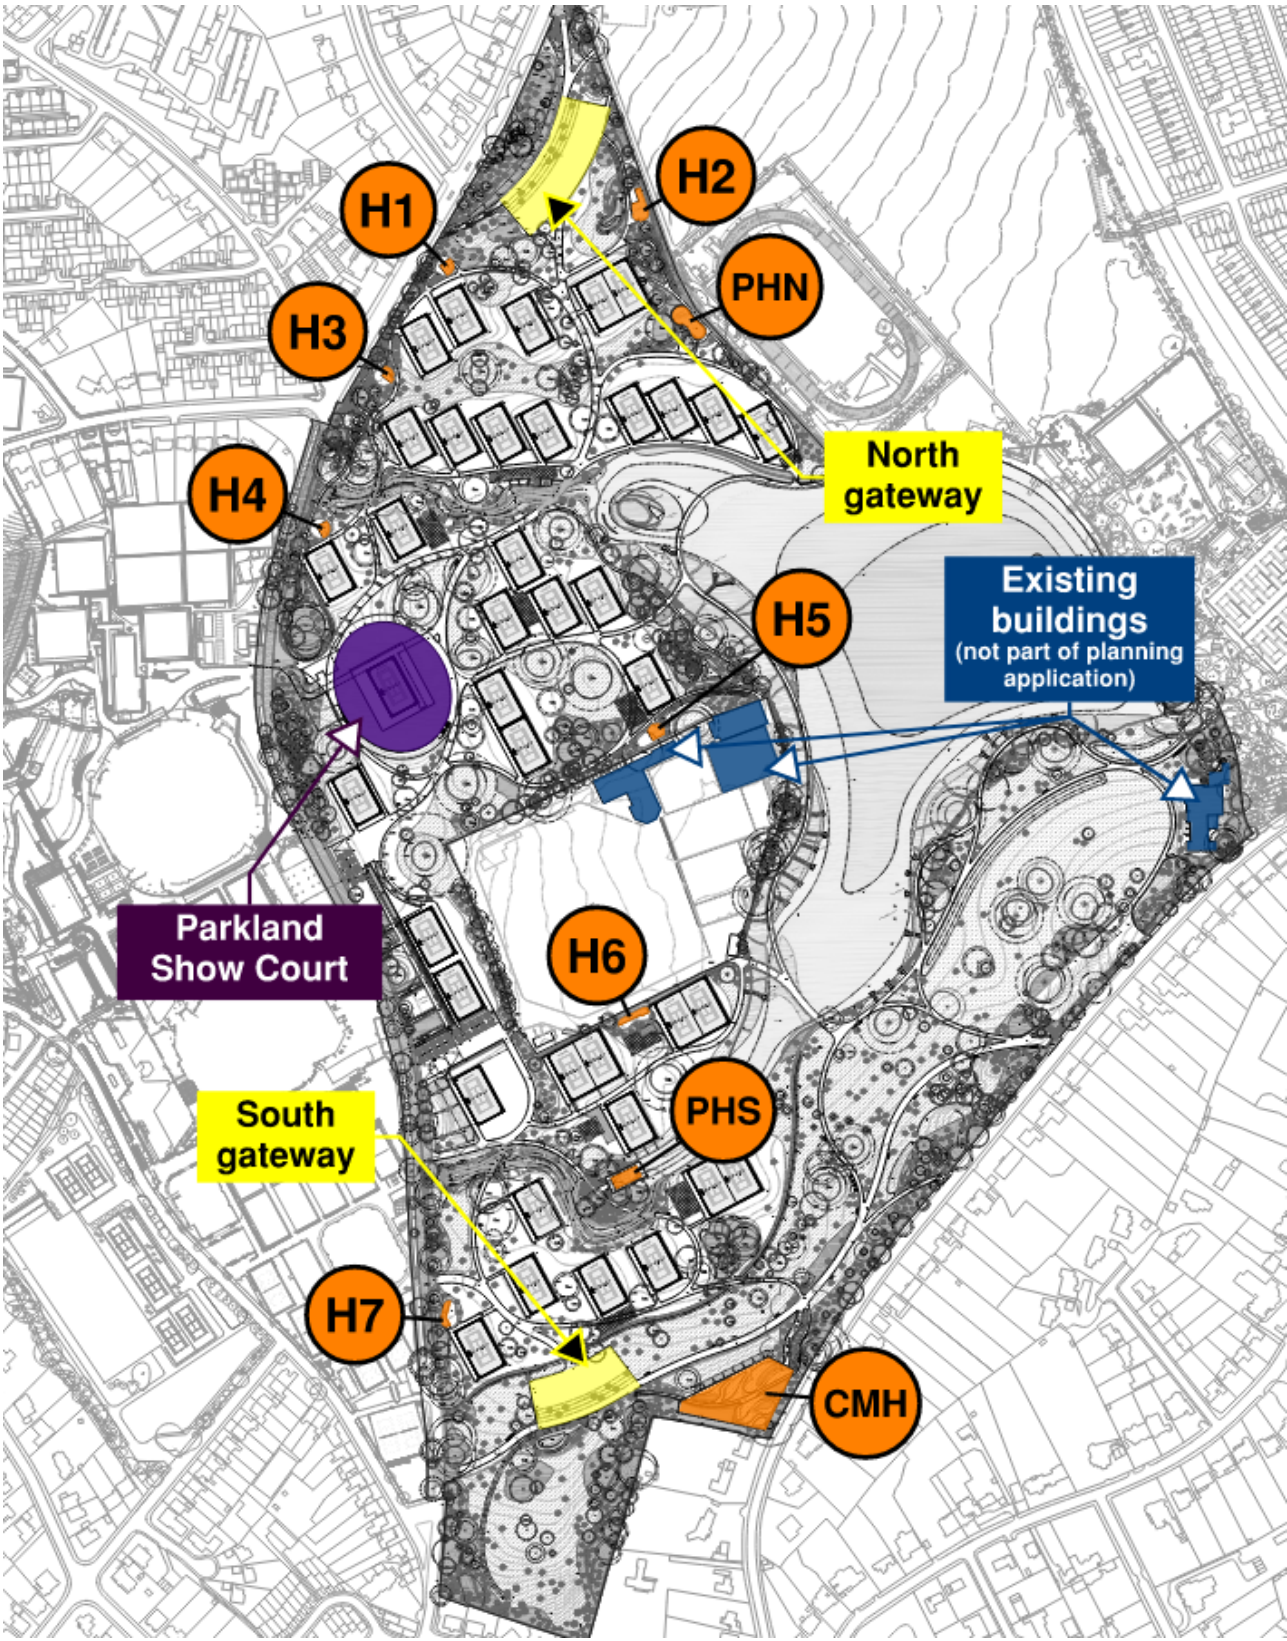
1 Schematic plan of site showing building locations for reference with Table 2—1
